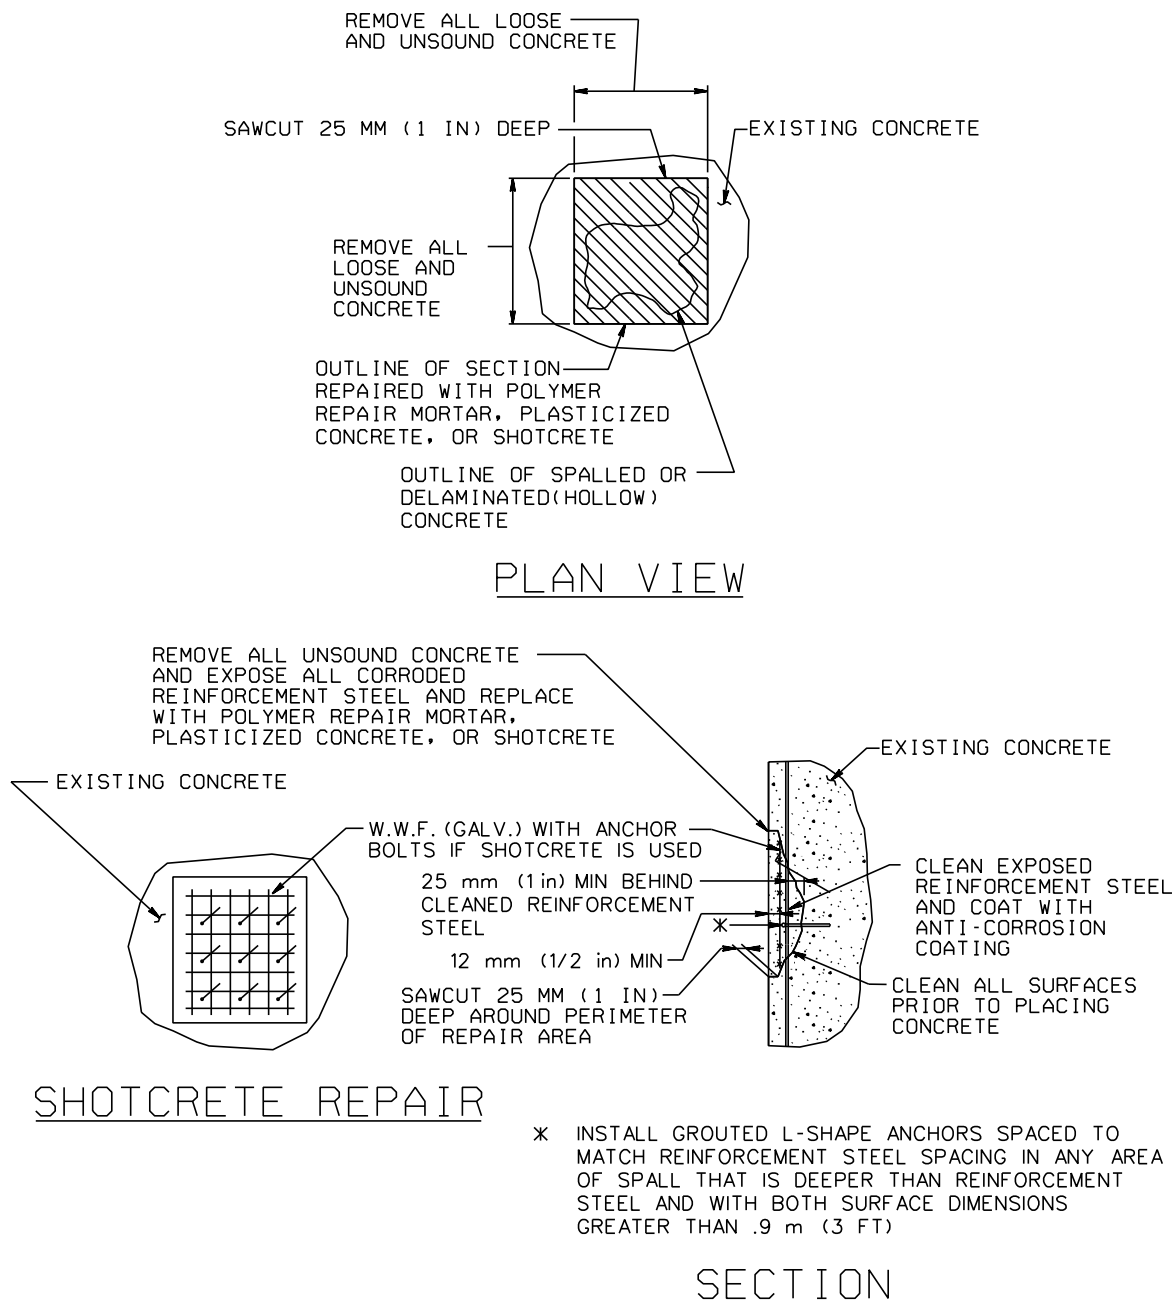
Deep Spall with Exposed Adequate Reinforcement Steel (using polymer repair mortar, plasticized concrete or shotcrete) (FHWA, 2005)
